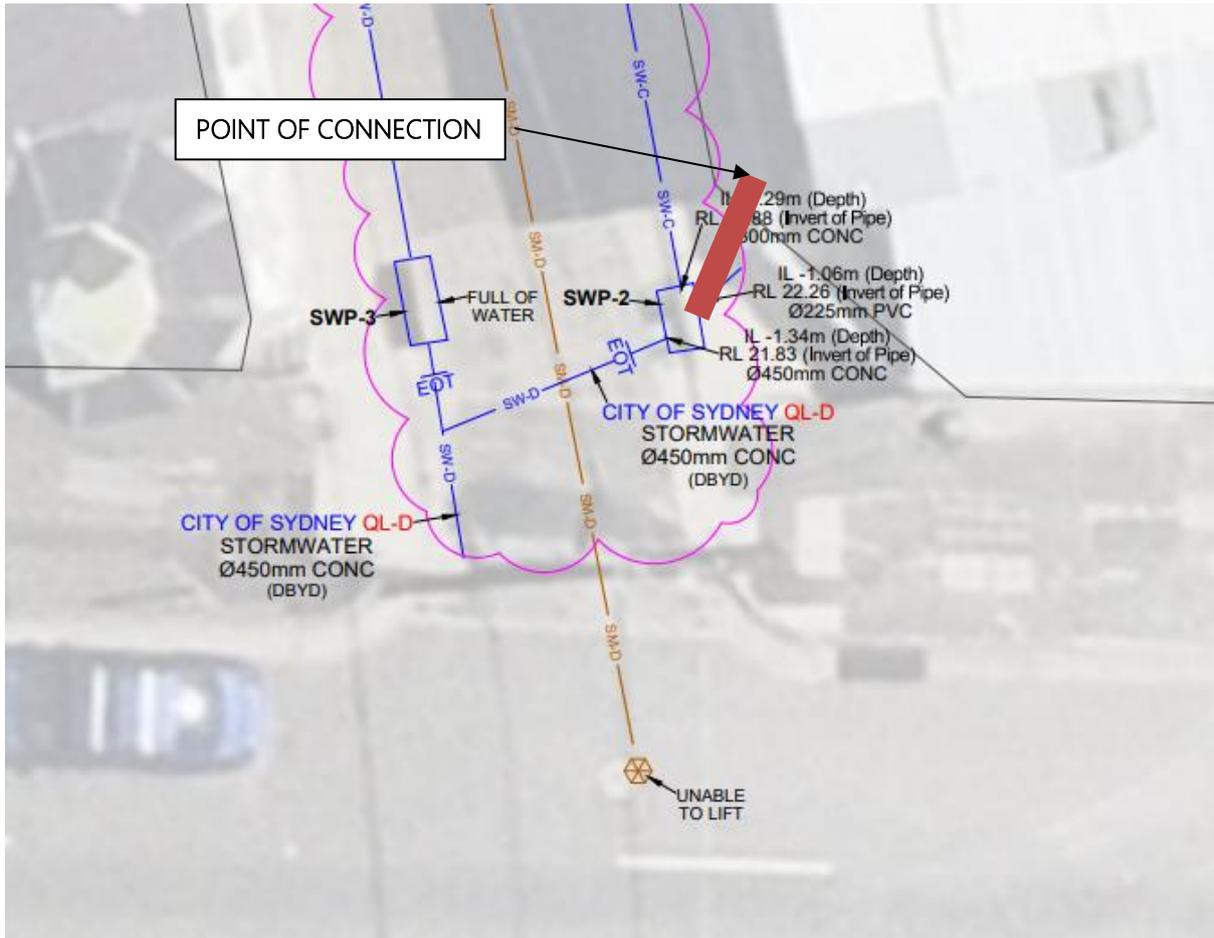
Extract from Survey by Richard Crookes Constructions Pty Ltd
